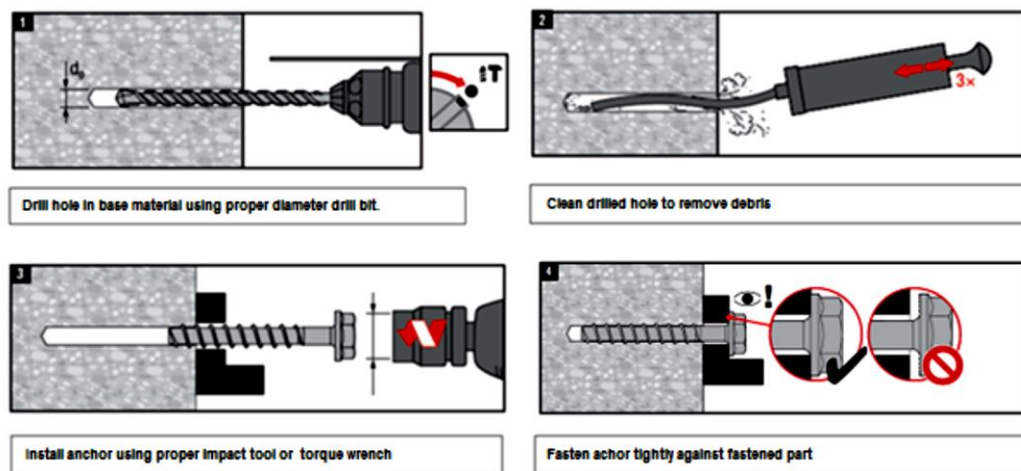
INSTALLATION INSTRUCTIONS – HILTI KWIK HUS-EZ (KH-EZ)
